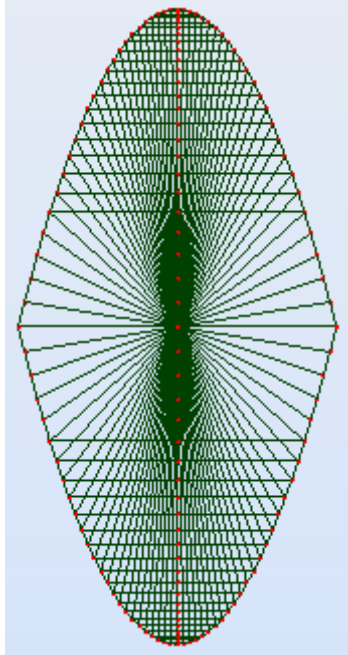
Cross-section of the triple parabolic arch model.
